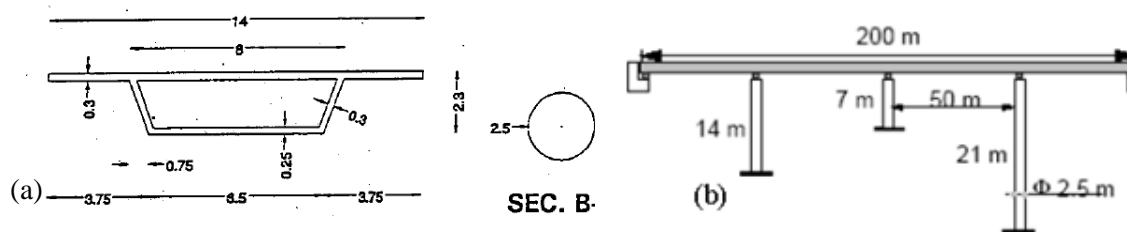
Chinese irregular RC bridge geometries: a) deck and pier sections b) irregular pier configuration.
